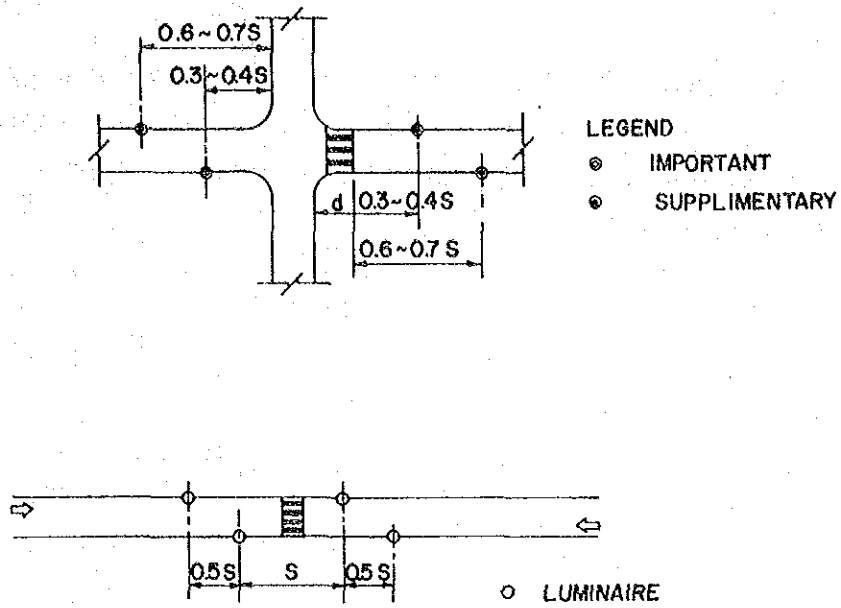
Typical Luminaire Arrangement (Crosswalk)
